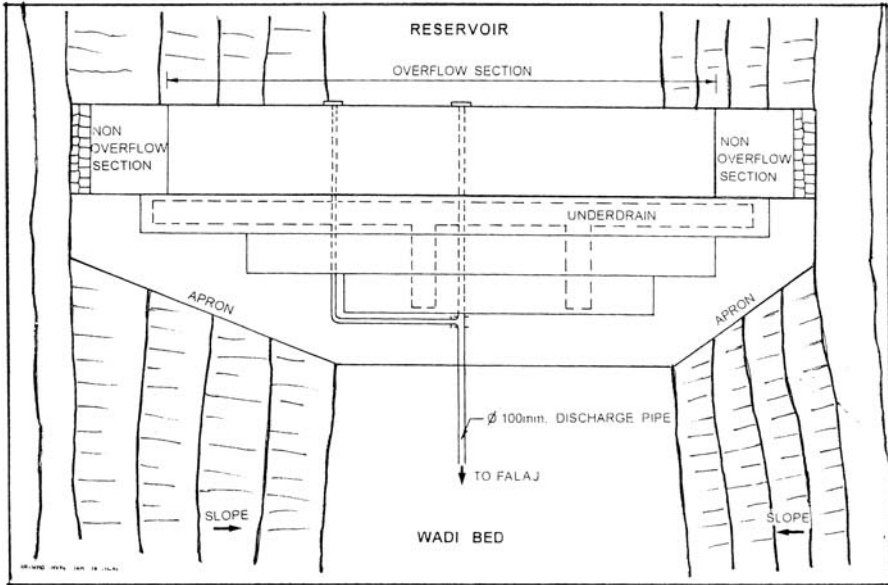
(a). Plan view of a new retention dam (Schmid & Al-Batashi, 1993)
